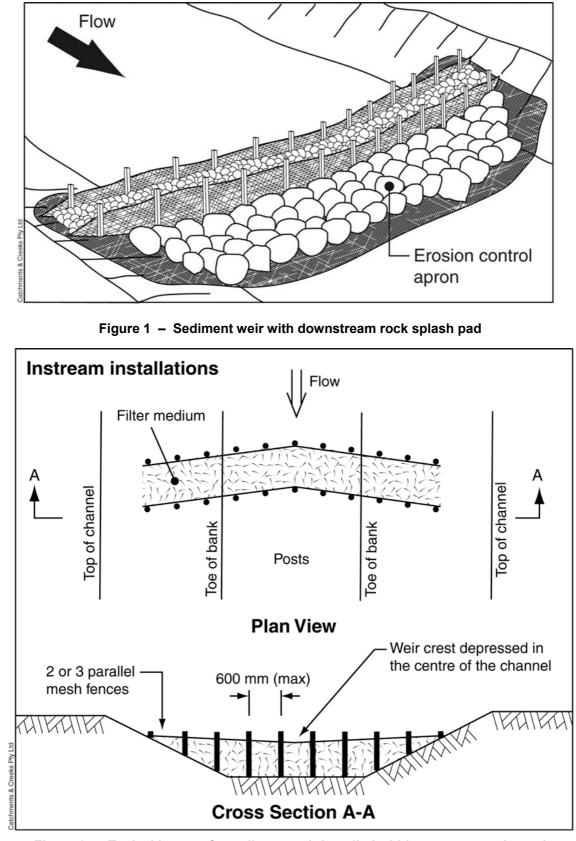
Typical layout of a sediment weir installed within a waterway channel
